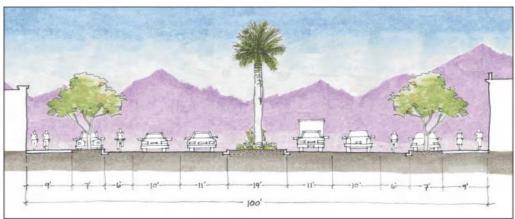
Harrison Street from Grapefruit Boulevard to Avenue 50 looking north – Proposed Option 1
